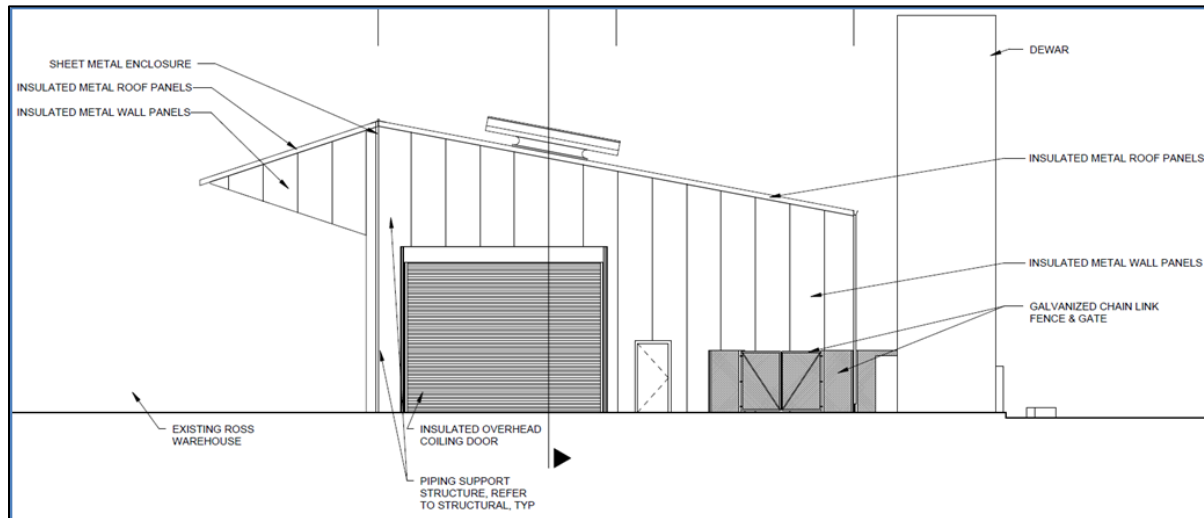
Elevation View of LBNF Cryogenic Compressor Building Showing Roof Connection to Existing Warehouse
